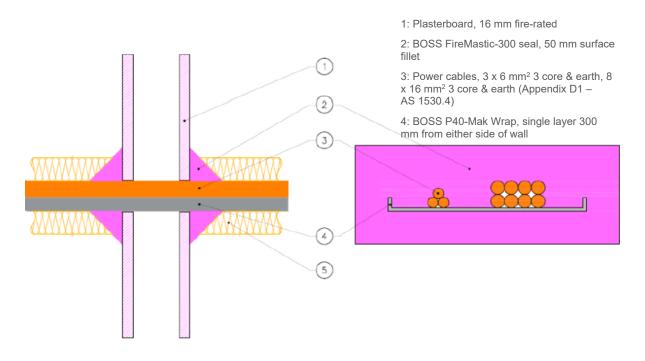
Specimen 6 in test report FSP 1833 - a set of three and eight bundle of cables on a steel cable tray penetrating a plasterboard wall system
